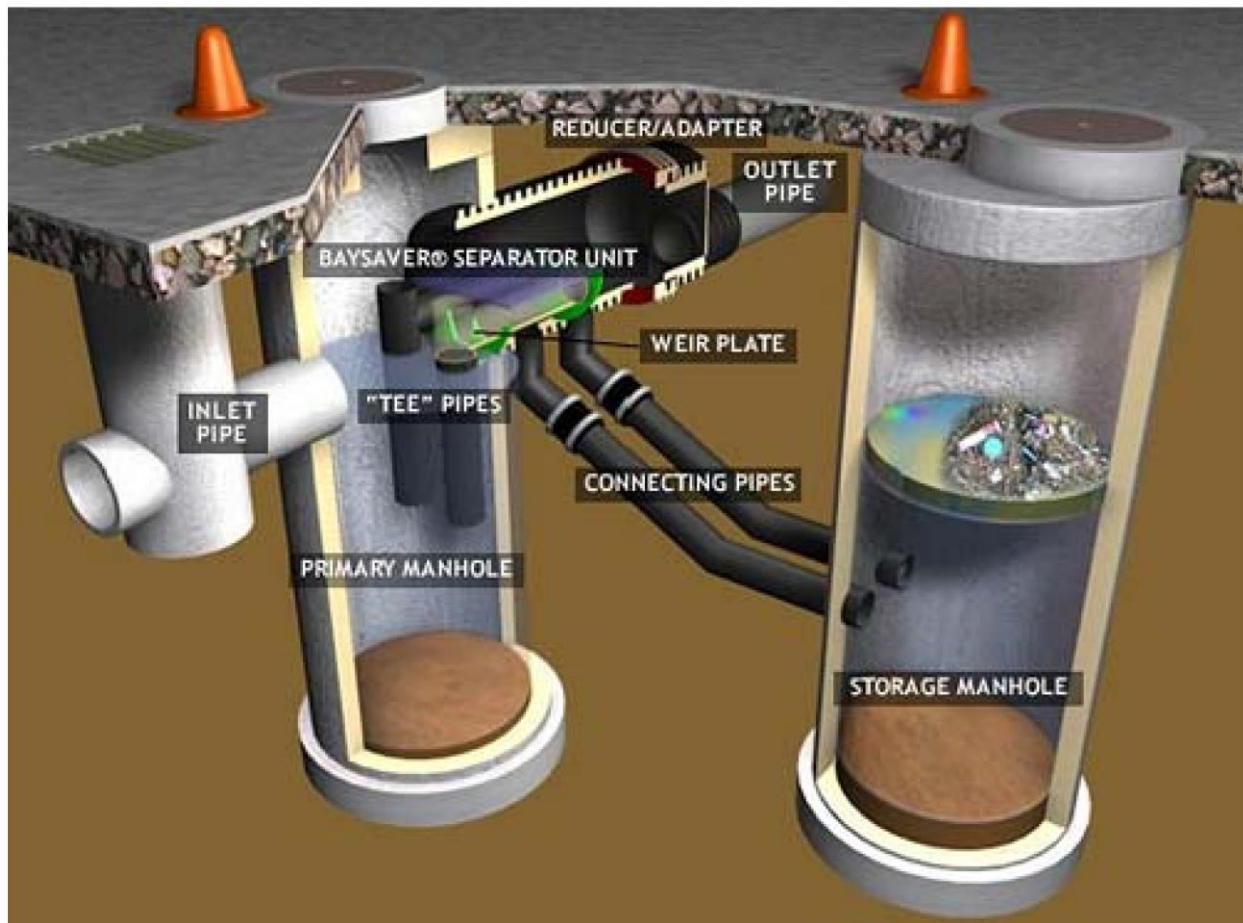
Typical BaySeparator™ Stormwater Filtration System
